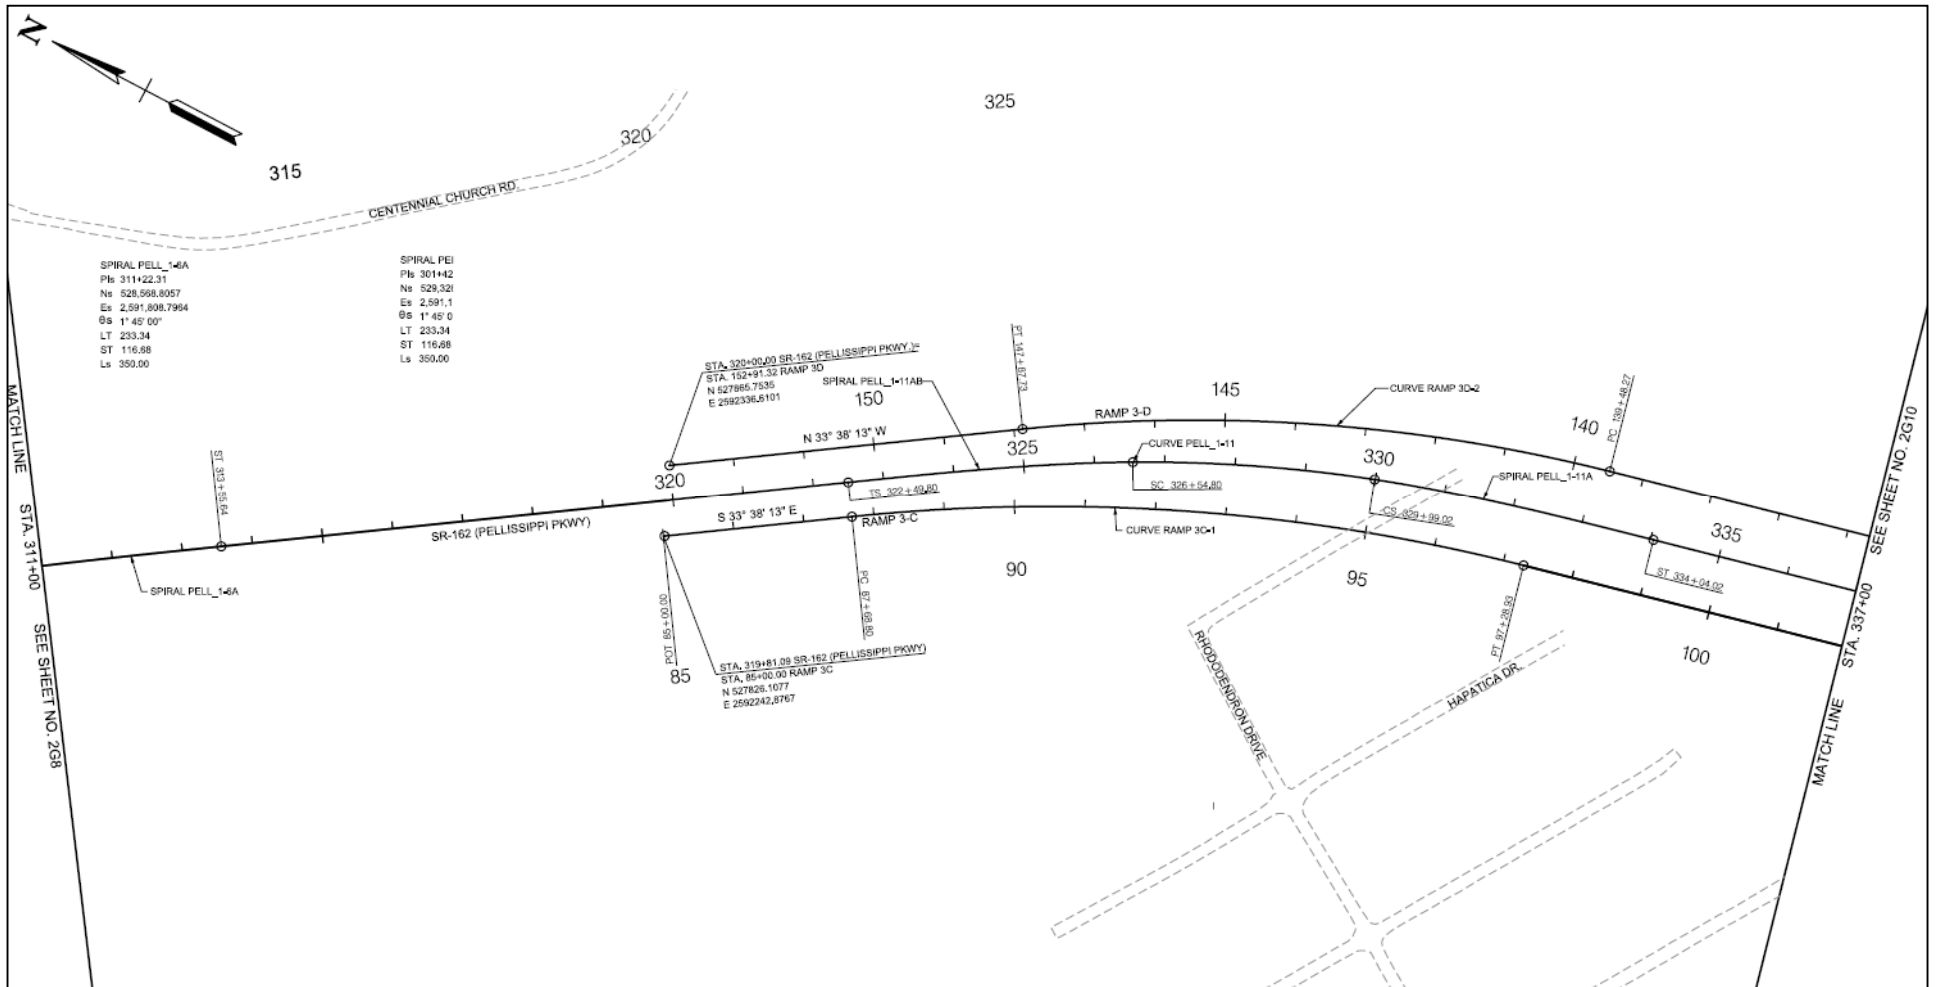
Overview 10 of 11 of the SR-162 Road Extension project from north to south.
